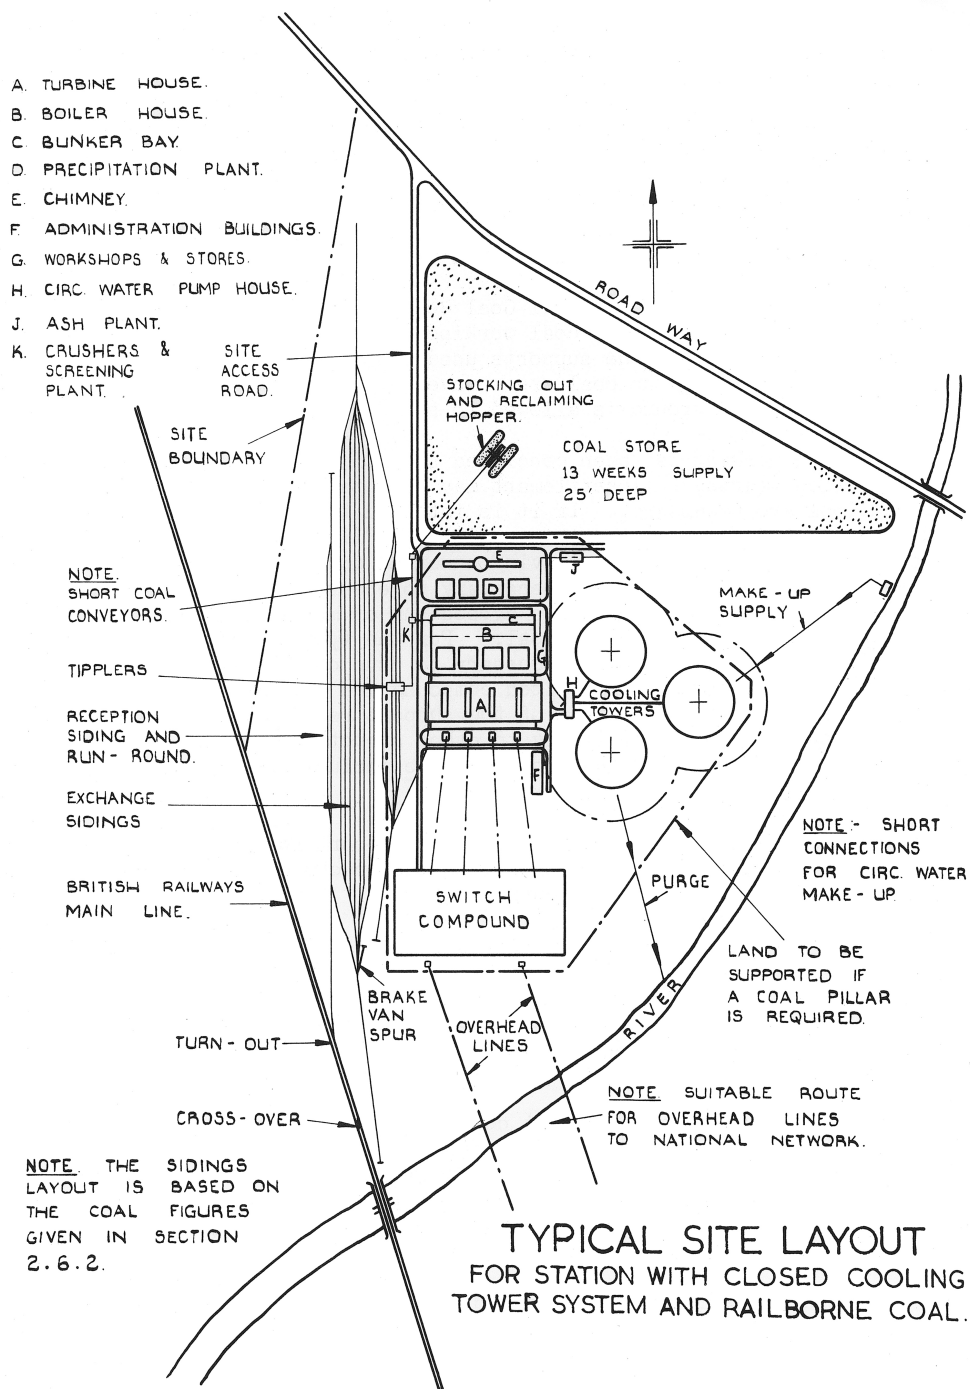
TYPICAL SITE LAYOUT FOR STATION WITH CLOSED COOLING TOWER SYSTEM AND RAILBORNE COAL.
